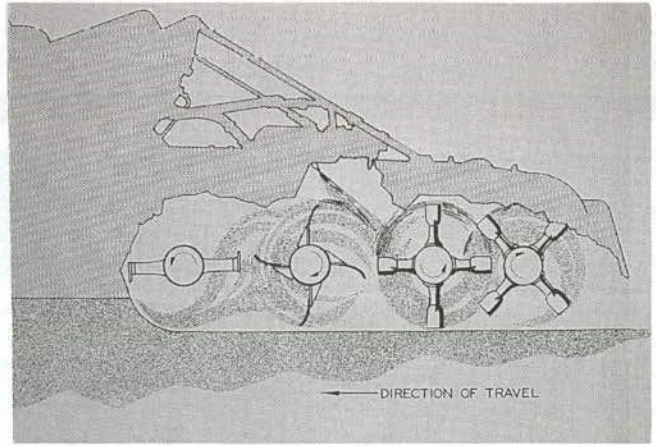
Large pulverizing machine for pavement removal and sizing.
